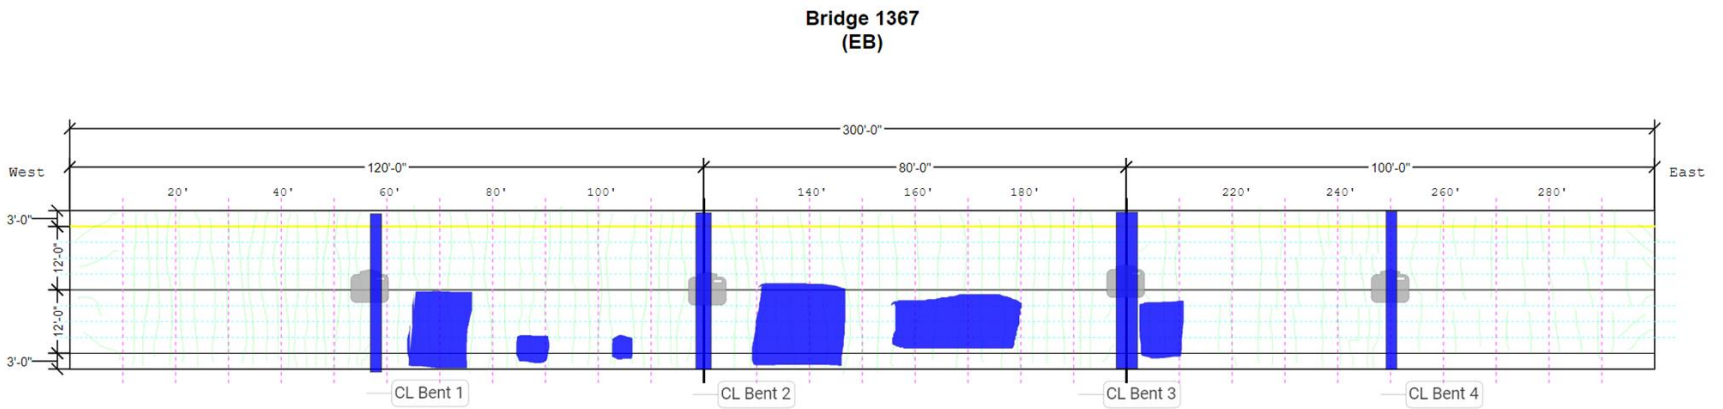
Field notes for Bridge 1367, 2020 inspection, soffit.
